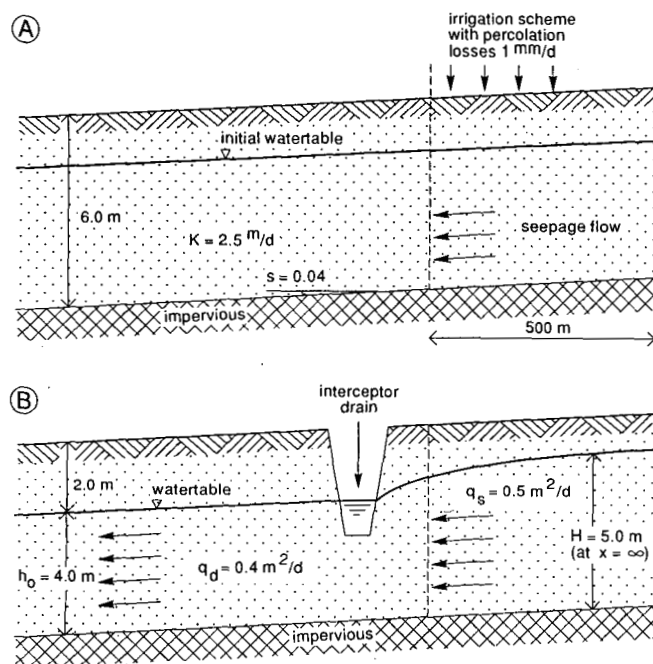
The calculation of an interceptor drain in a sloping area: (A) before construction and (B) after construction (Example 8.8)
